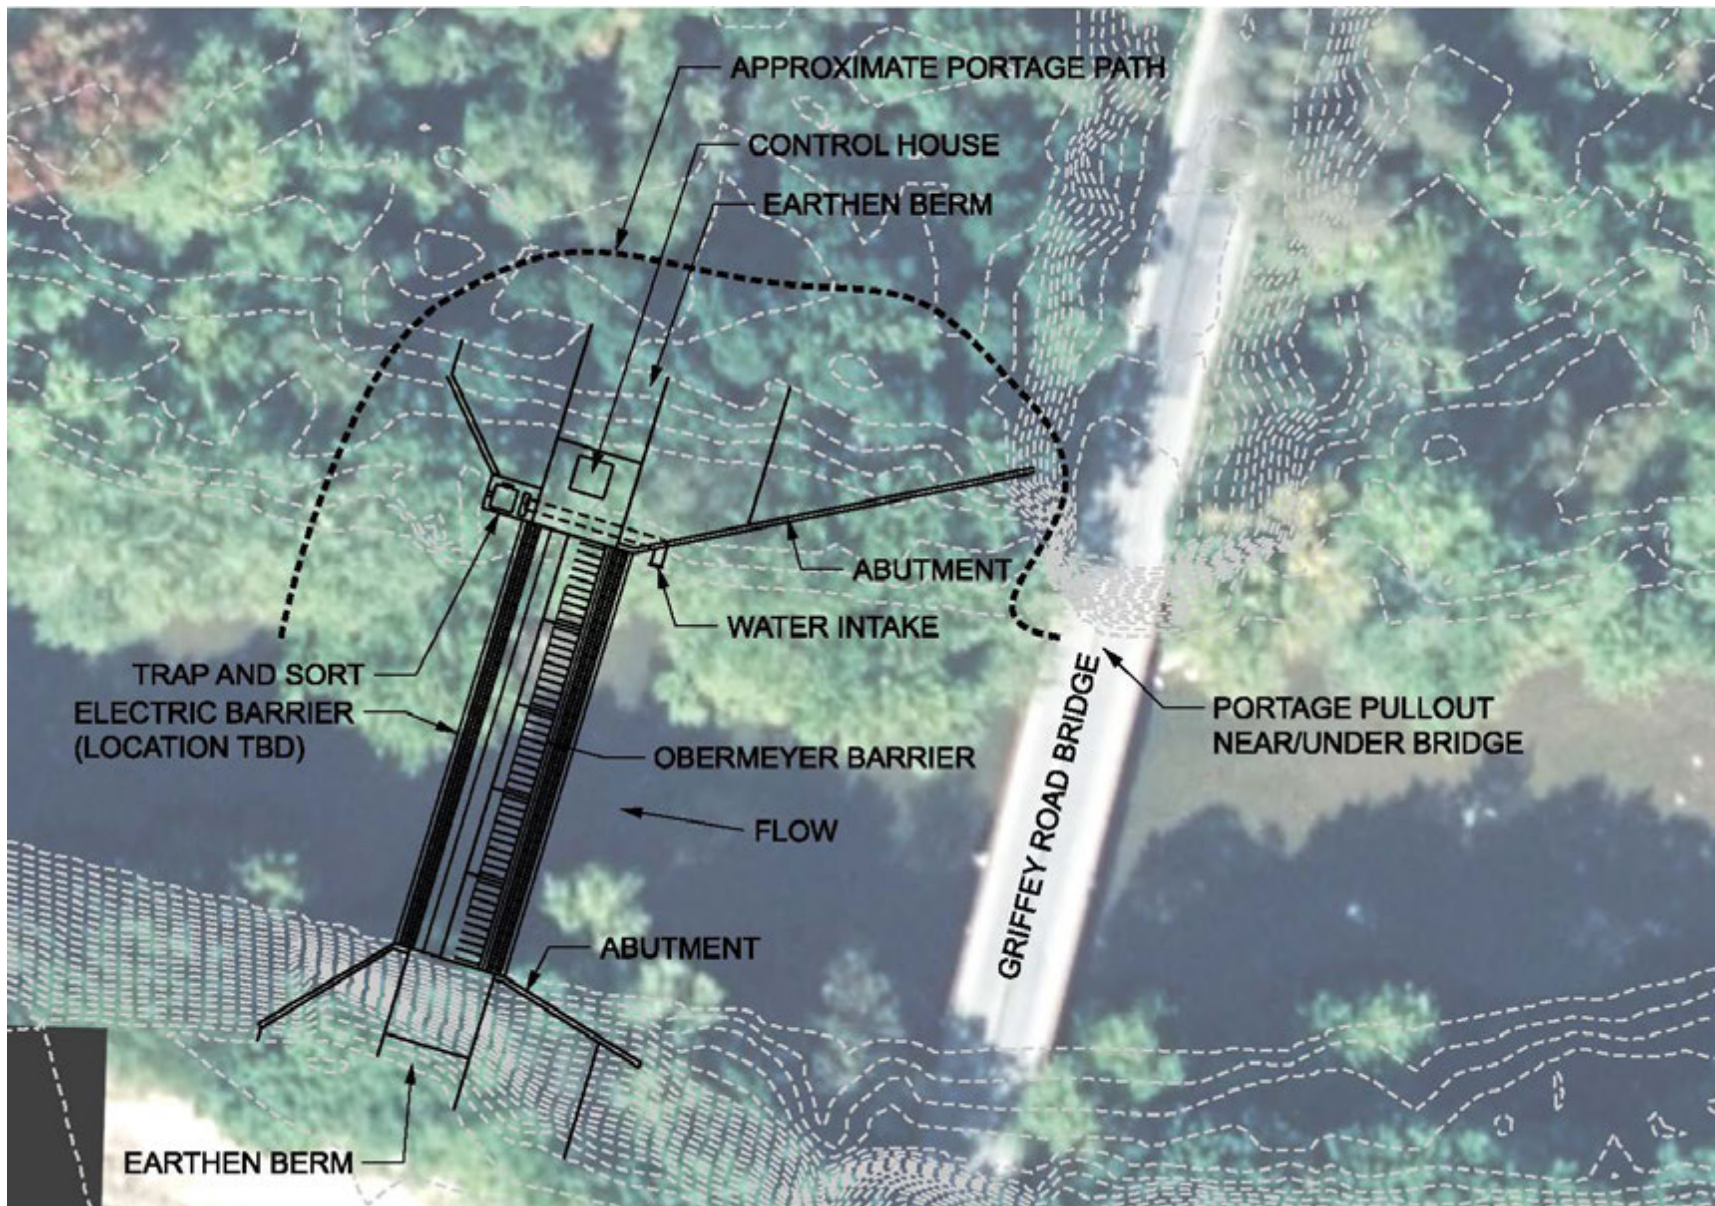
Plan view of the seasonal barrier, trap and sort, portage.
